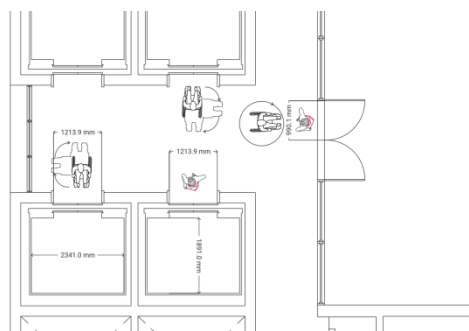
Floor plan of doors and elevators at Pan Pacific Orchard
